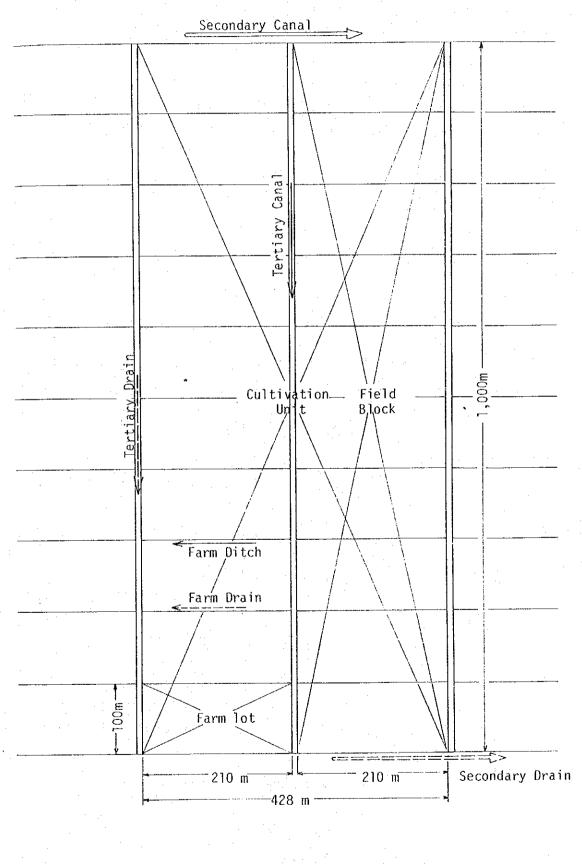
Typical Layout Plan of On-farm Facilities
